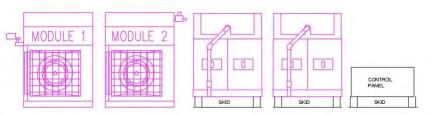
Modular Shipment: Individual Modules are Shipped with the Spray Section/Heat Transfer Section Removed and the Control Panel Removed, and are Connected, Assembled, and Wired On-Site
